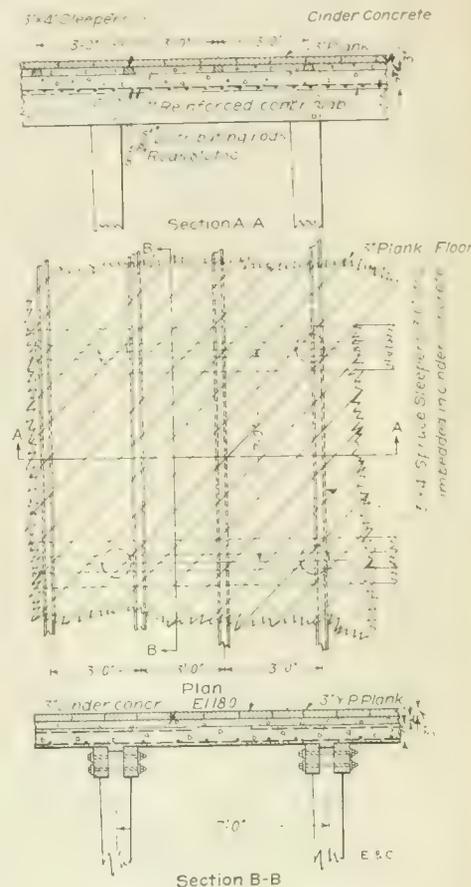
Plan and Sections of First Floor of Commonwealth Pier No. 1, Showing Details of Construction.
